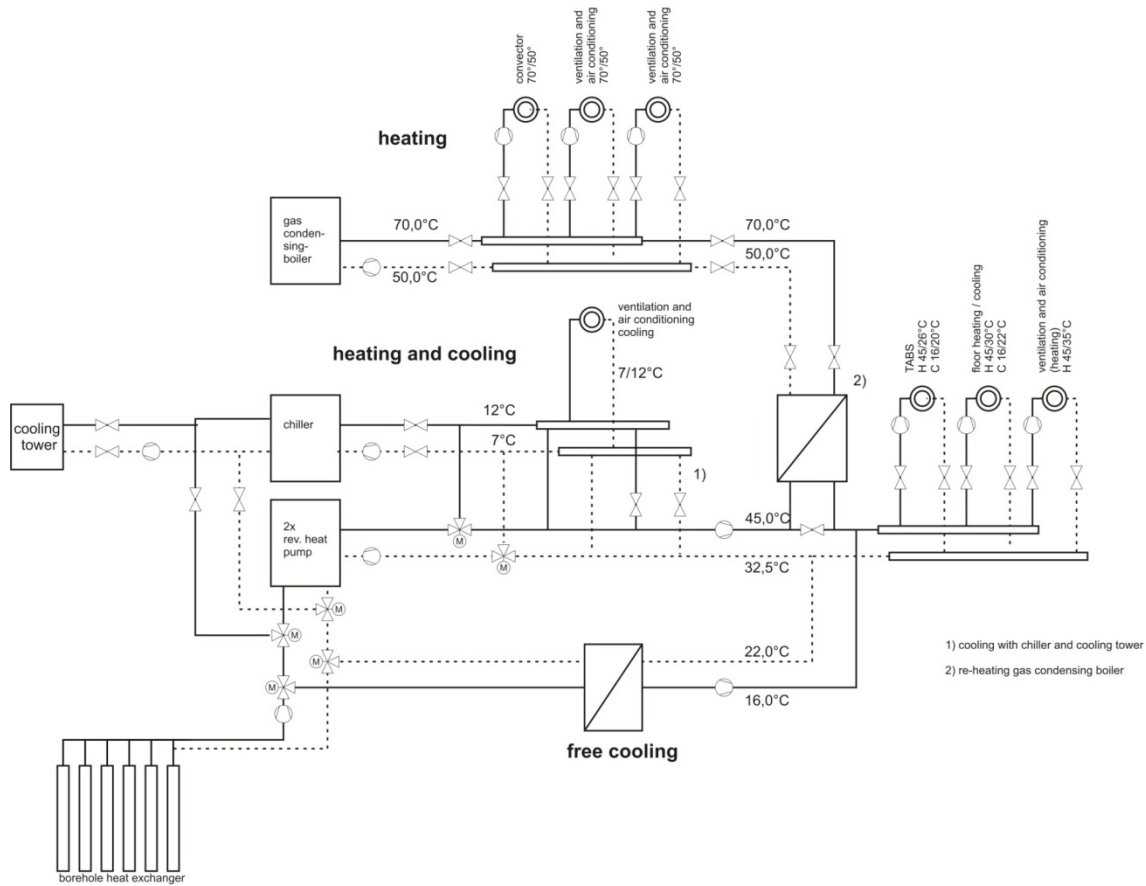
Hydraulic scheme of the HVAC plant of building E
